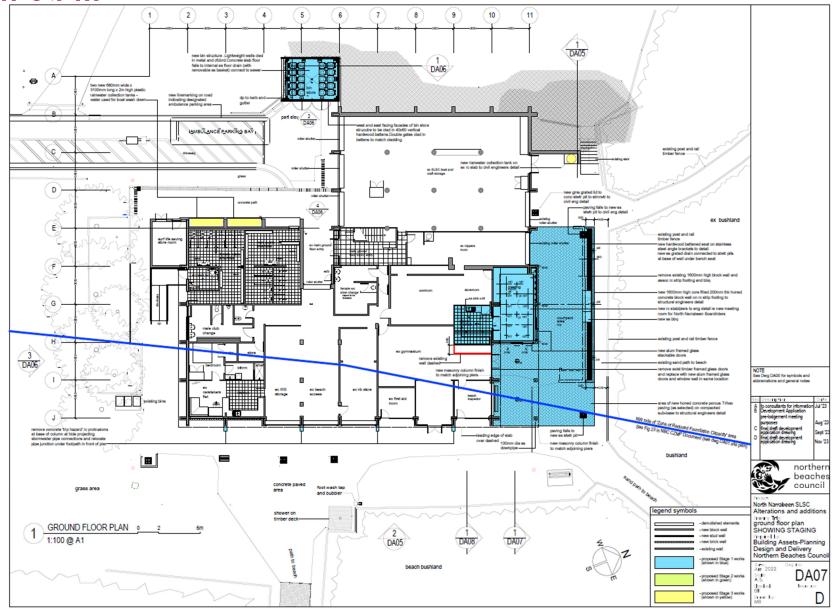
Drawing no. DA07 – Alterations and Additions to the Ground Floor, Showing Staging
